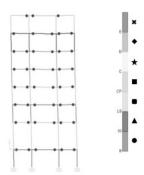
Plastic Hinges Location of Frame F due to MCE in Y Direction
